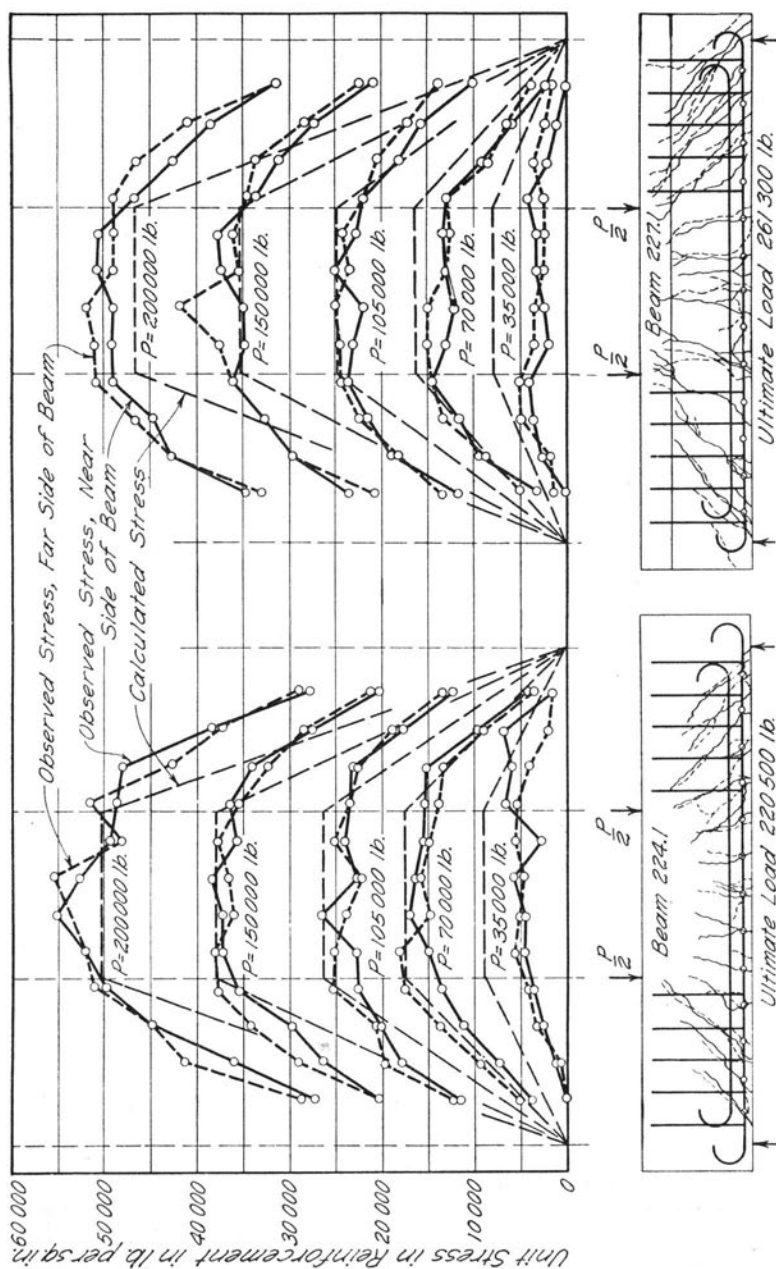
MEASURED STRESSES IN LONGITUDINAL REINFORCEMENT OF RECTANGULAR BEAM AND T-BEAM, SERIES OF 1922
